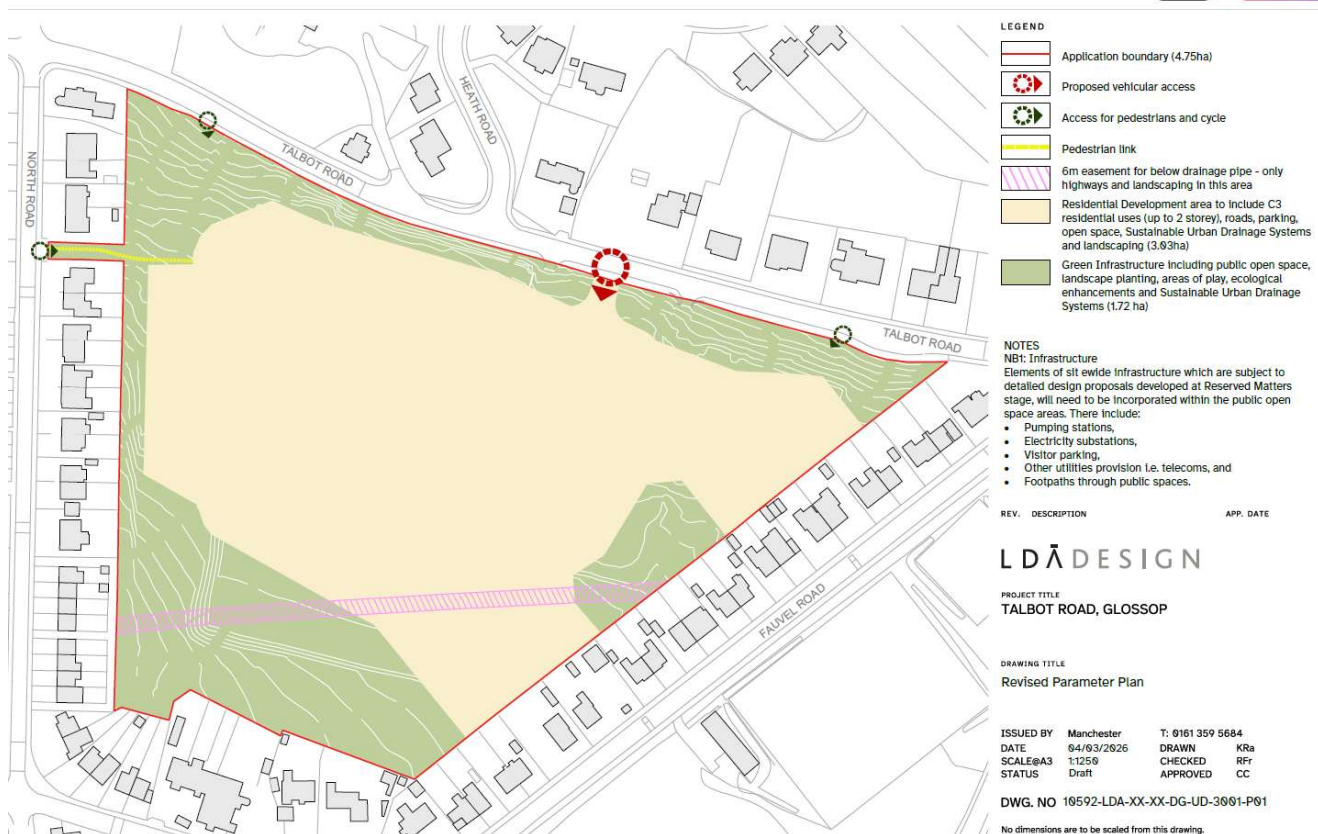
Figure E: Site development drawings show a culvert marked through the southern section of the site (shown in pink). This would need to be taken into account if releveling the land for sports use.
